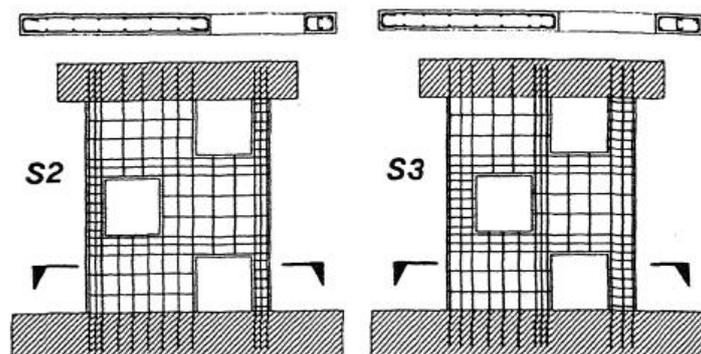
Wall specimens S2 and S3 (Yanez et al., 1991)
